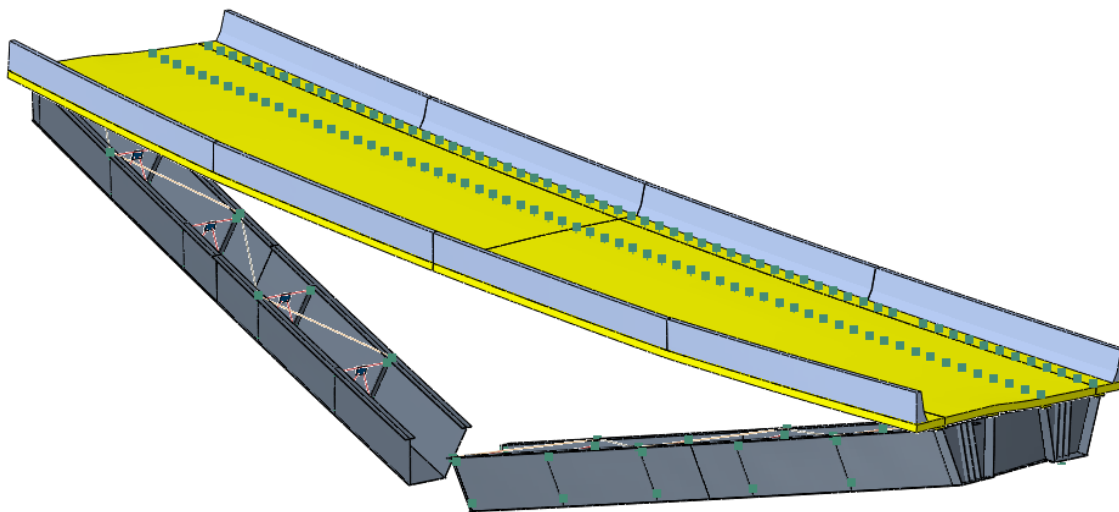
Shear stud failure along the exterior girder and detachment of exterior girder from the slab.
